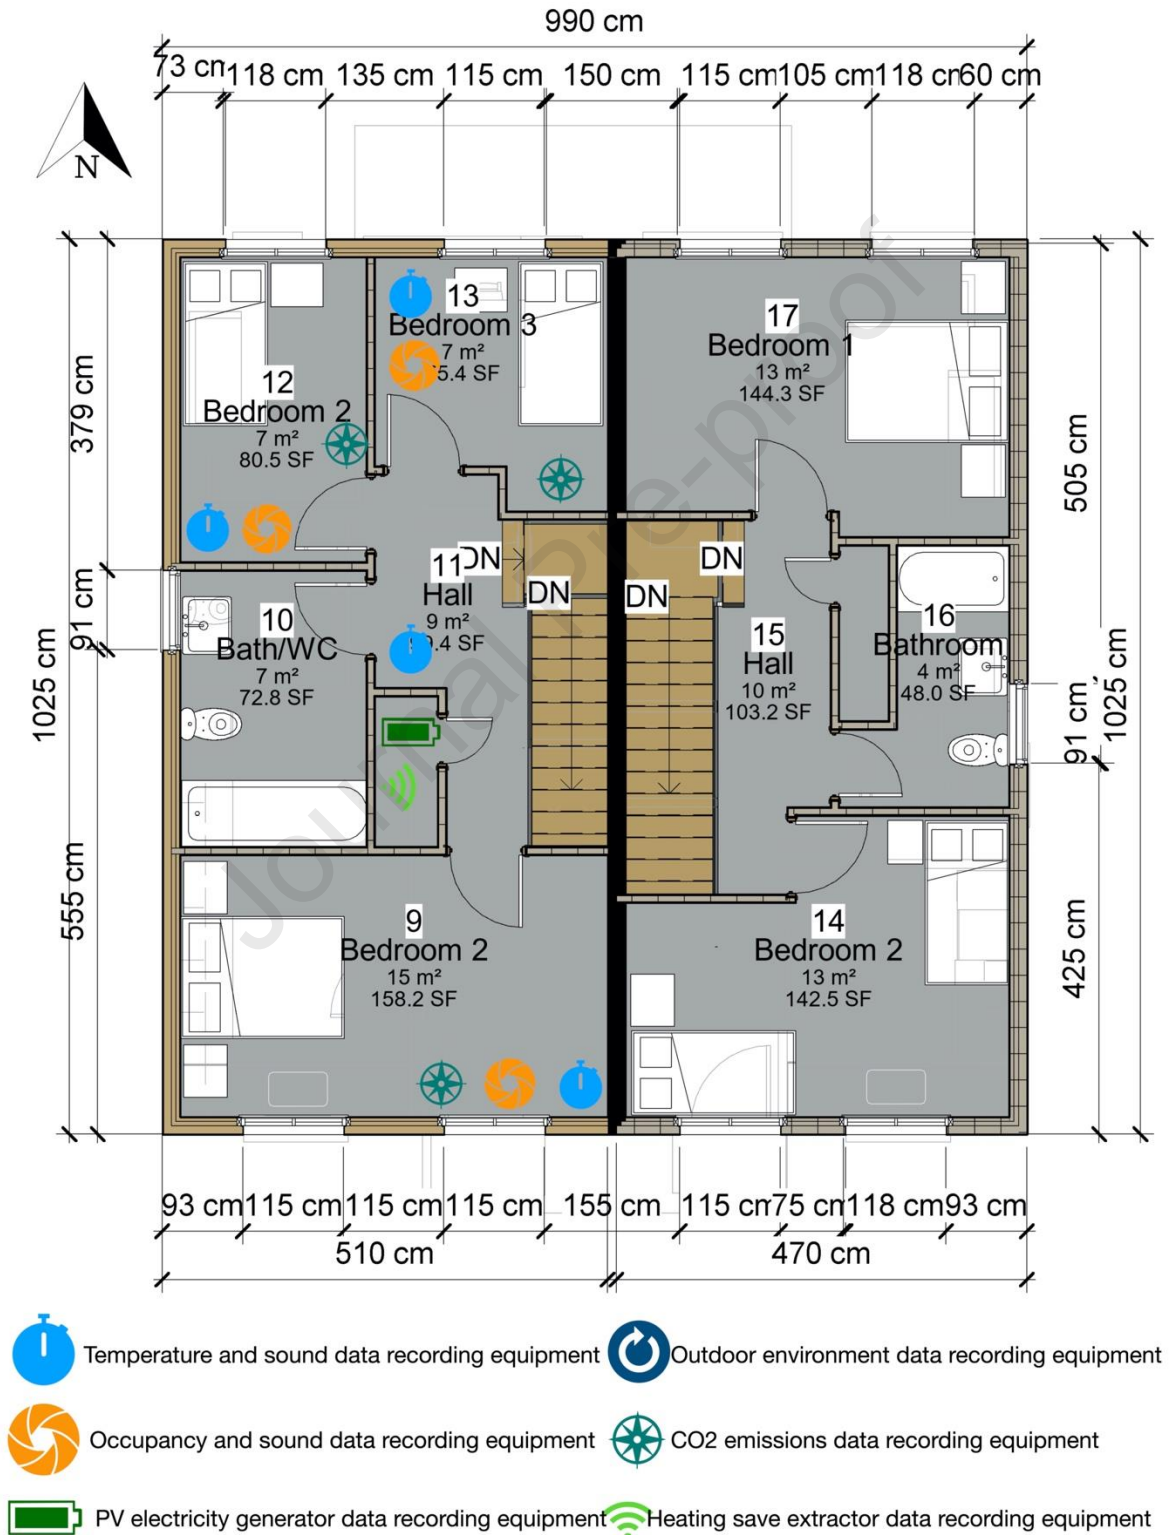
(a) The floorplan of ground floor area of the base-case prototype house, including the monitoring equipment installed in the property. *Image credit:* Floor plan layout was modelled by the author using the Autodesk® Revit® software suite.
